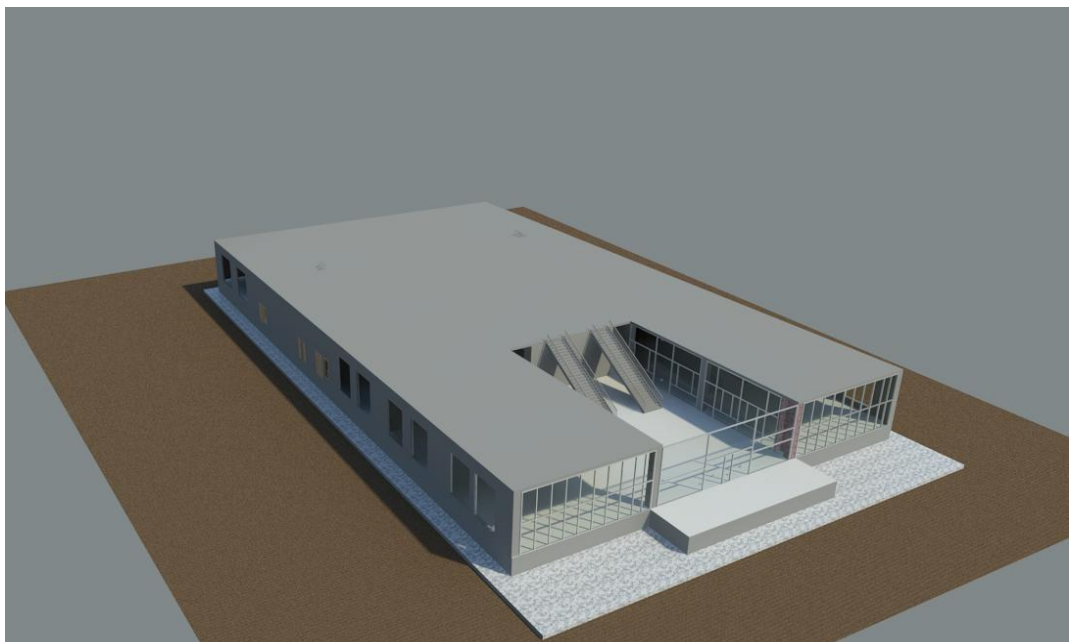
Shows model of 1st floor with roof of normal building with REVIT software
